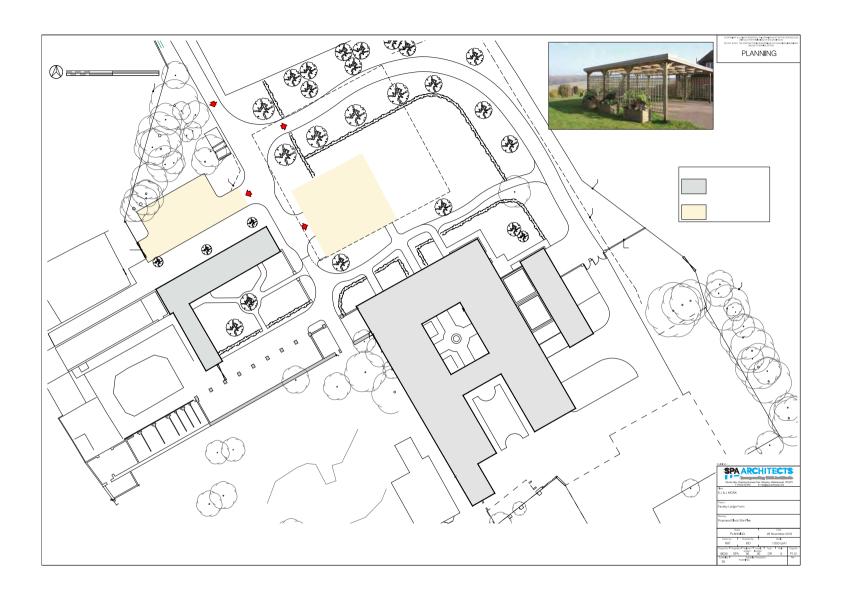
Proposed site development/parking plan (showing buildings proposed for retention and improvement)
